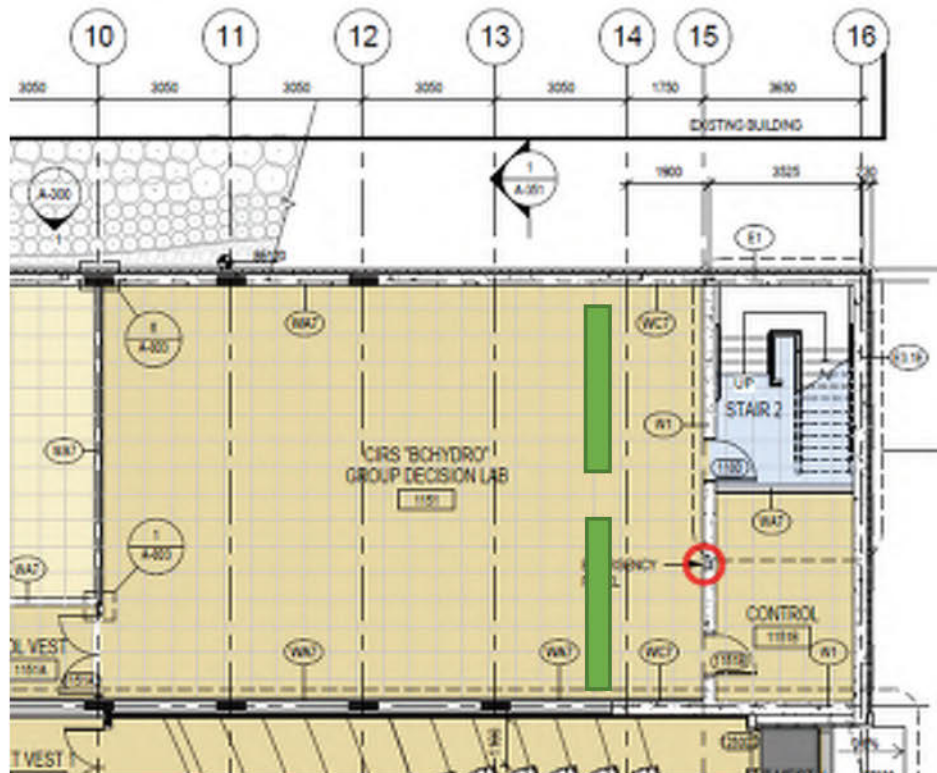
C: Plan drawing of BC Hydro Theatre at CIRS, UBC showing LW-A installation (Perkins+Will, 2009)
